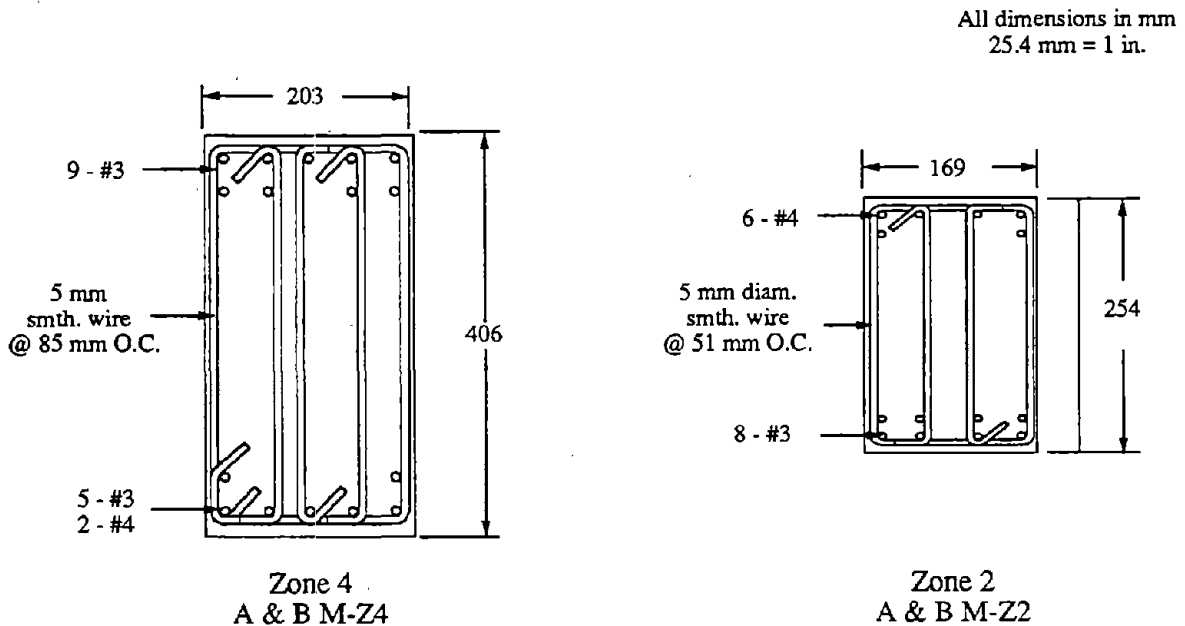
Model Beam Cross Sections for Monolithic Zones 2 and 4.
